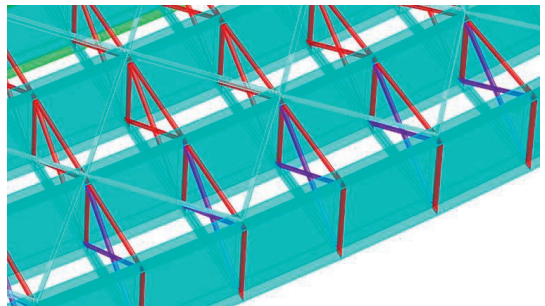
Detailed view of the 3D model, showing main girders, cross-frames, lateral bracing and web stiffeners. Source: PEDELTA
